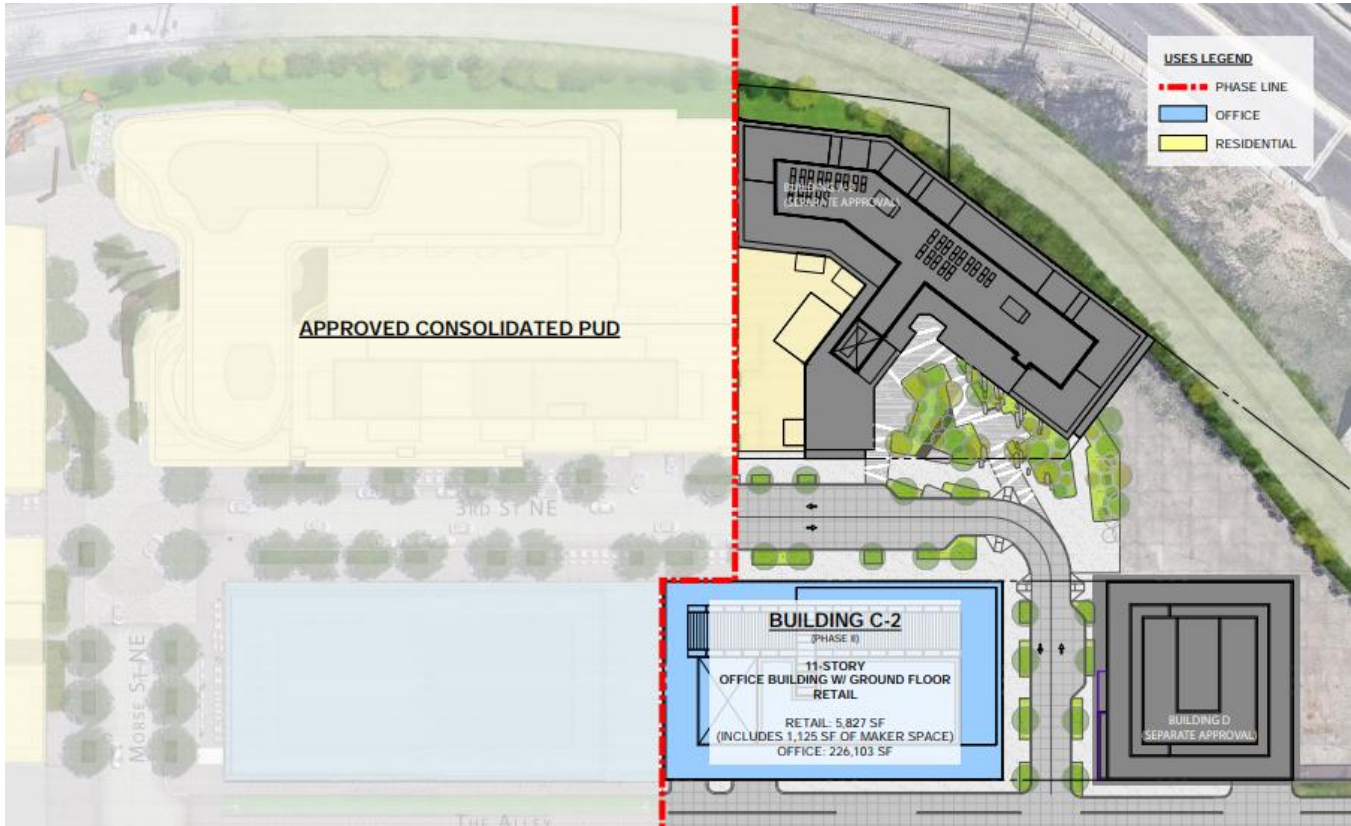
Site Plan for Building C2 (image provided by applicant in Exhibit 2E1).
